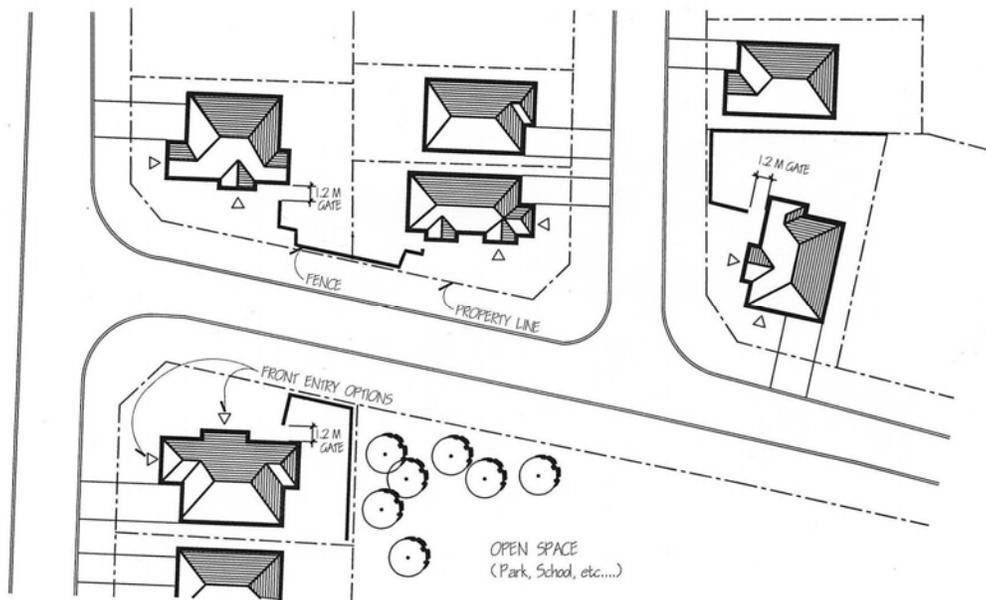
Typical Privacy Fence Layout Plan
